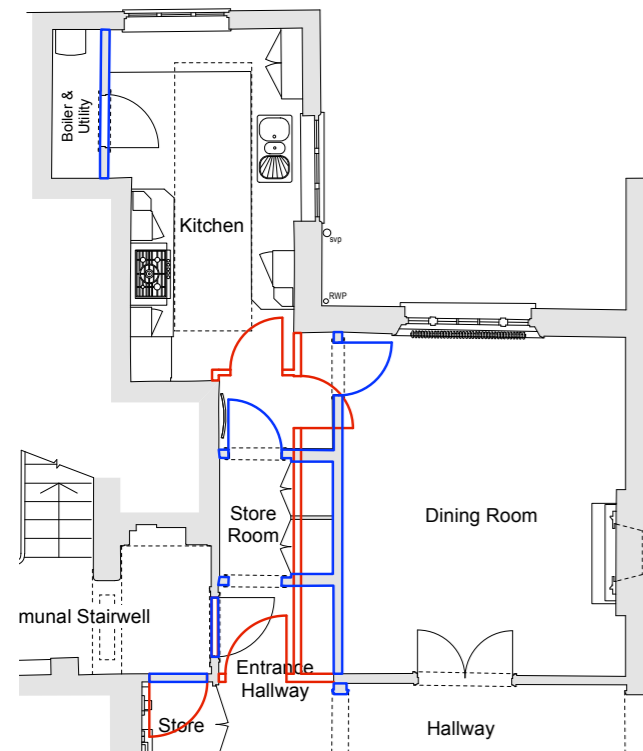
Existing Floor Plan extract with the 1949 Floor Plan overlaid in red and with modern, post 1949 partitions shown in blue.
